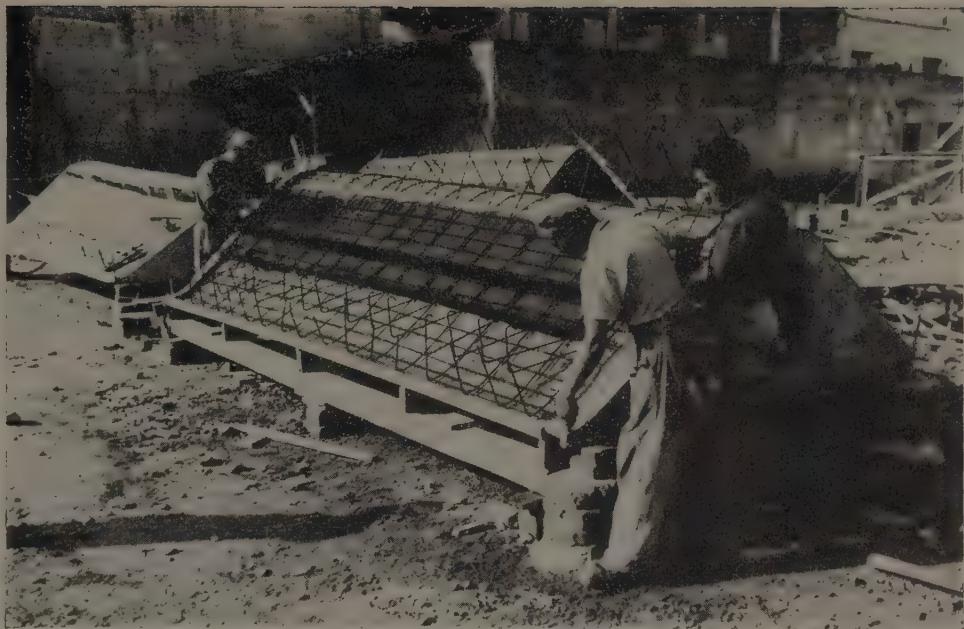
Exhibition Halls, Turin. Method of Construction Precast Concrete Unit
